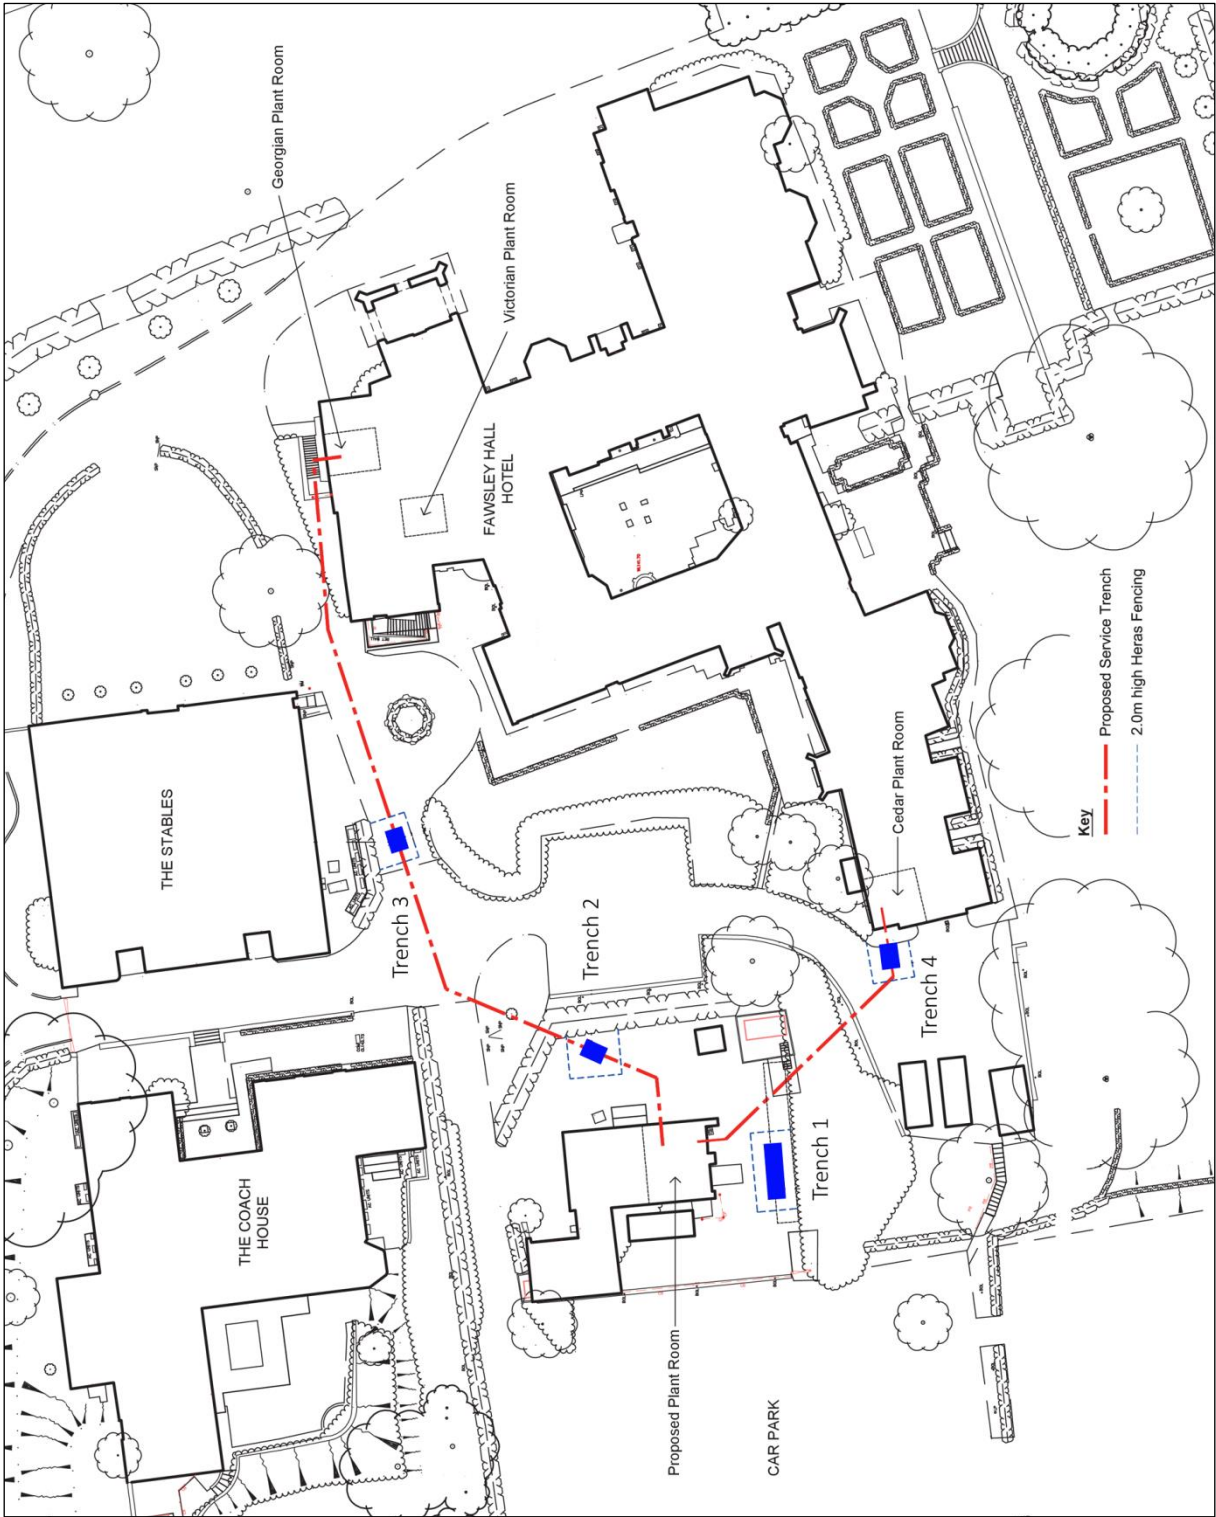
Proposed development with test pits marked in blue (scale 1:1000)
